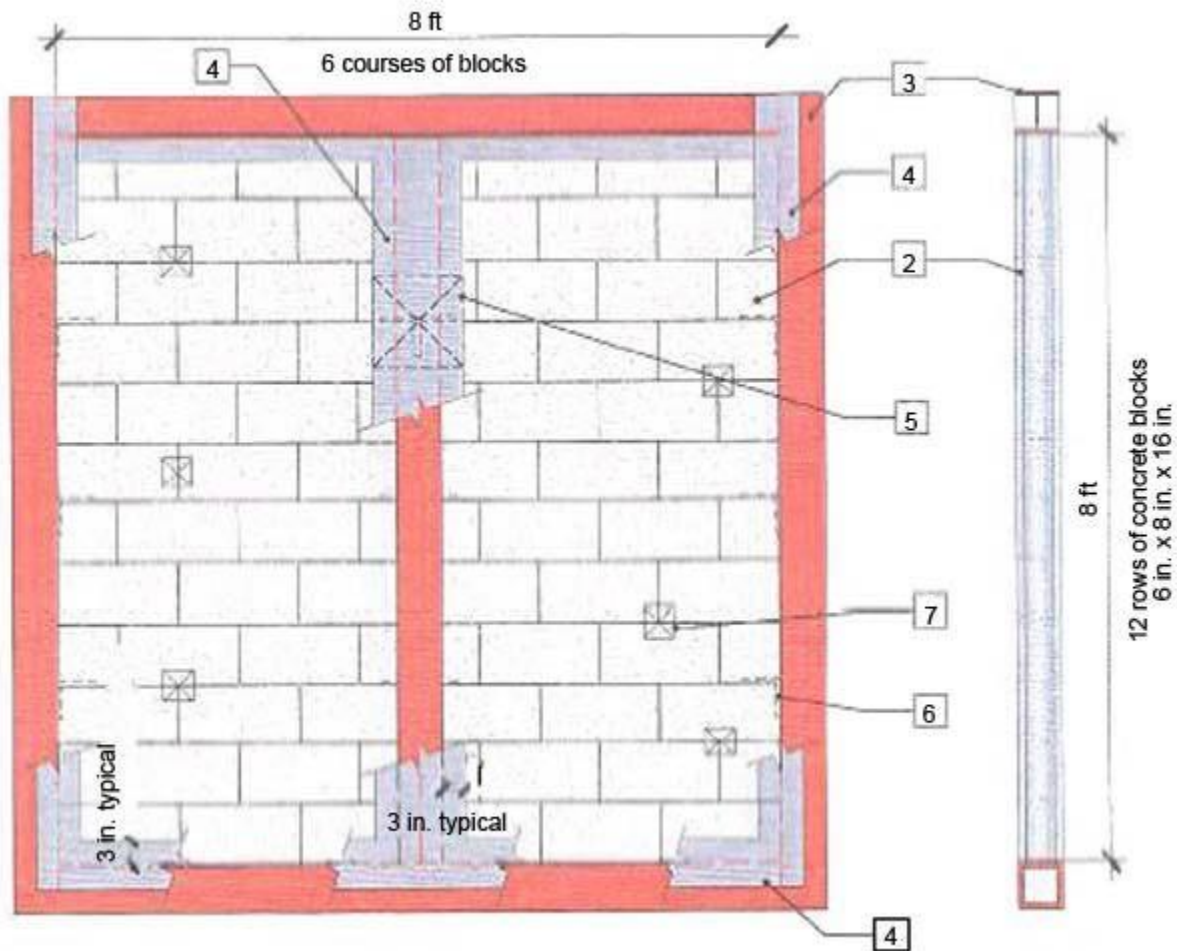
Specimen No. 1: Example of continuity across joints with transition membrane in masonry block infill wall with a steel frame
